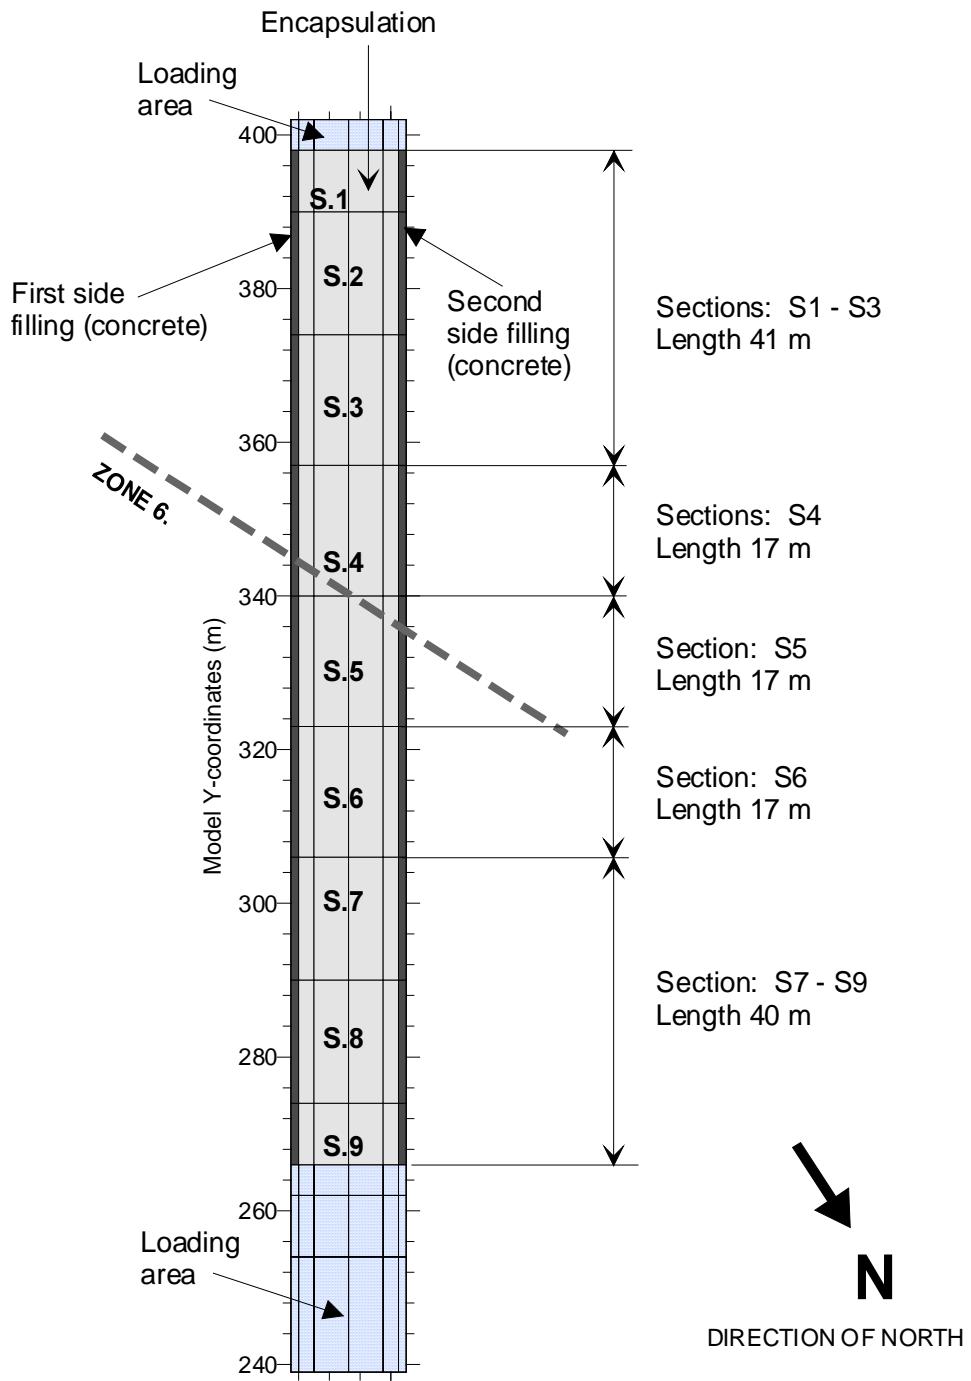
A vertical cross-section through the BMA tunnel, as defined in the detailed model.
